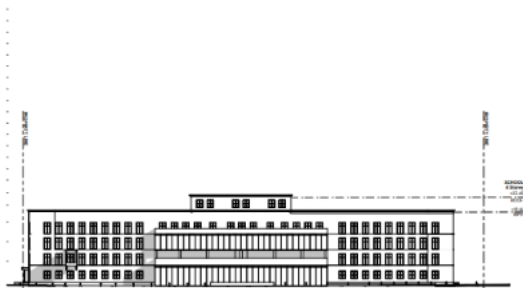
South elevation drawing of the Office Building included for illustration purposes (architectsAlliance, February 14, 2026).
